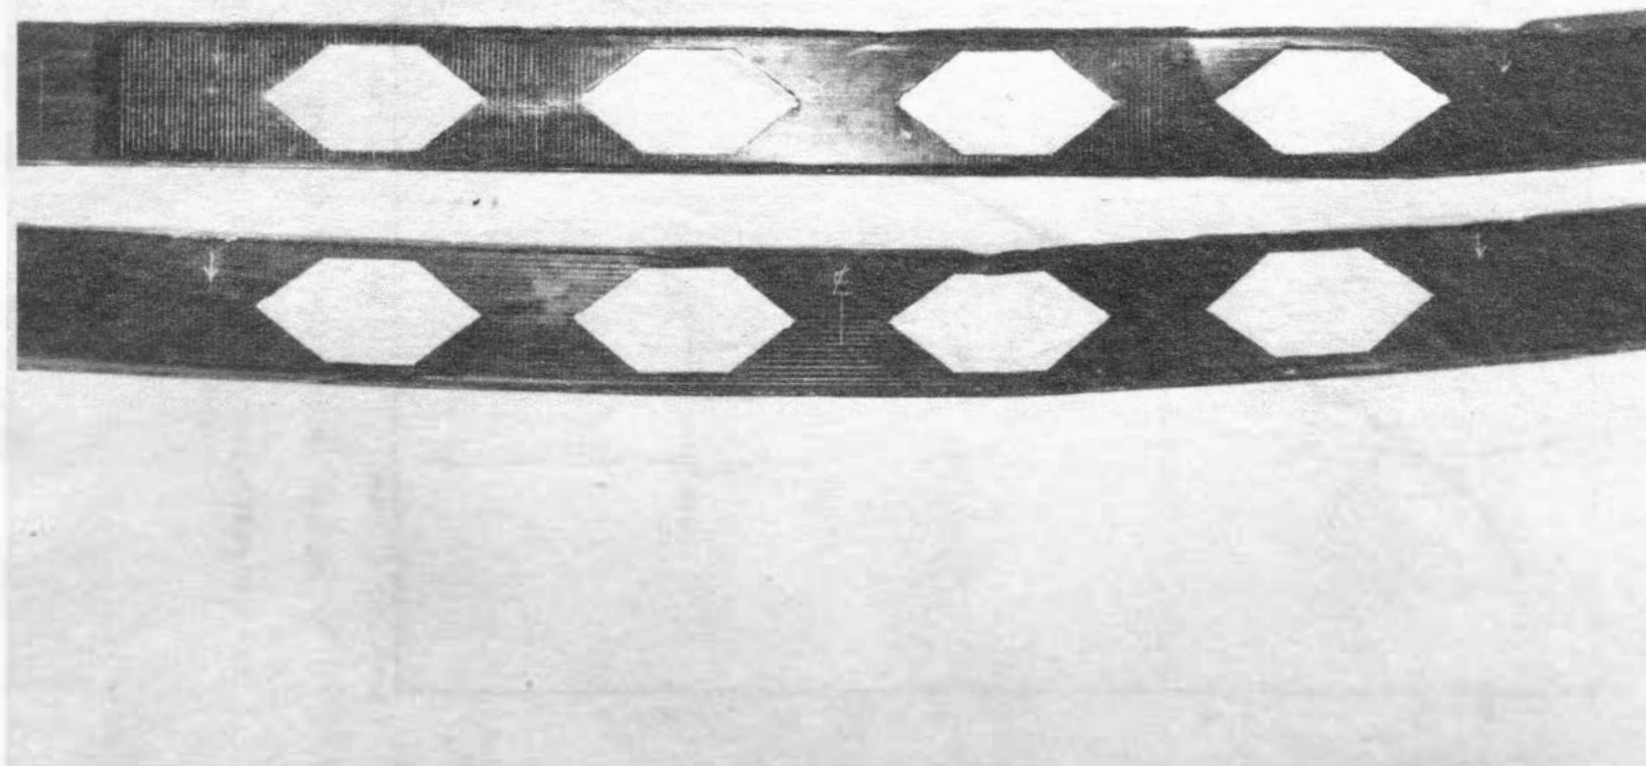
Front View of Specimens A-1 and A-2 After Testing
